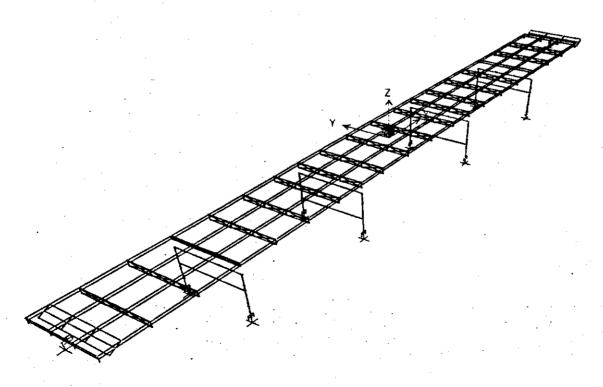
Mode 5, Period 0.1025 Seconds (Old Wahite Ditch Bridge)
